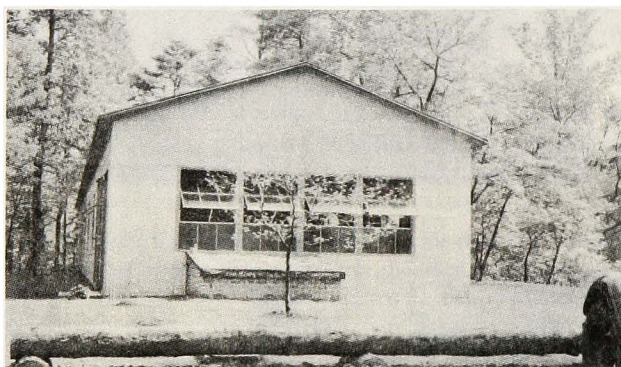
Completed building housing the new 85-foot wave tank of the BEB, located on the Dalecarlia Reservation in Washington, D.C.
